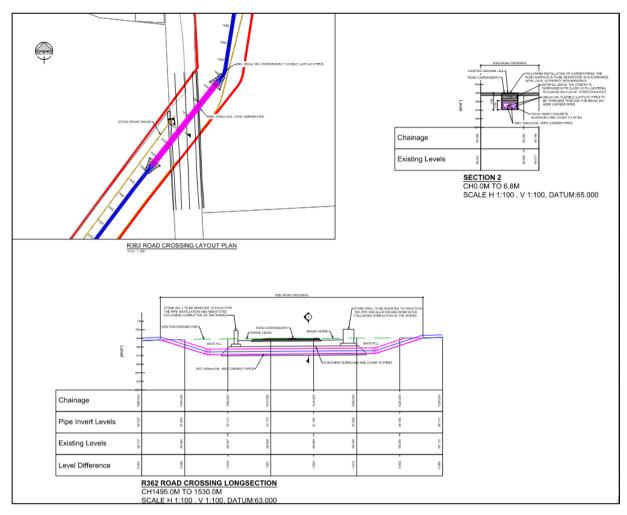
Proposed R362 road crossing detail. Source Dwg. 24821-MWP-00-00-DR-C-0401 (MWP) | not to scale
